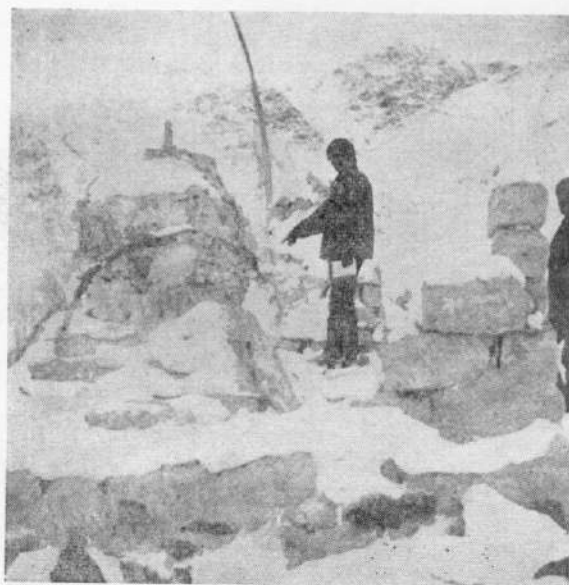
Damages to 'mane' at Shalkar village; that in front shows cracks whereas the spherical dome of that in the background had collapsed and the masonry rolled down.
